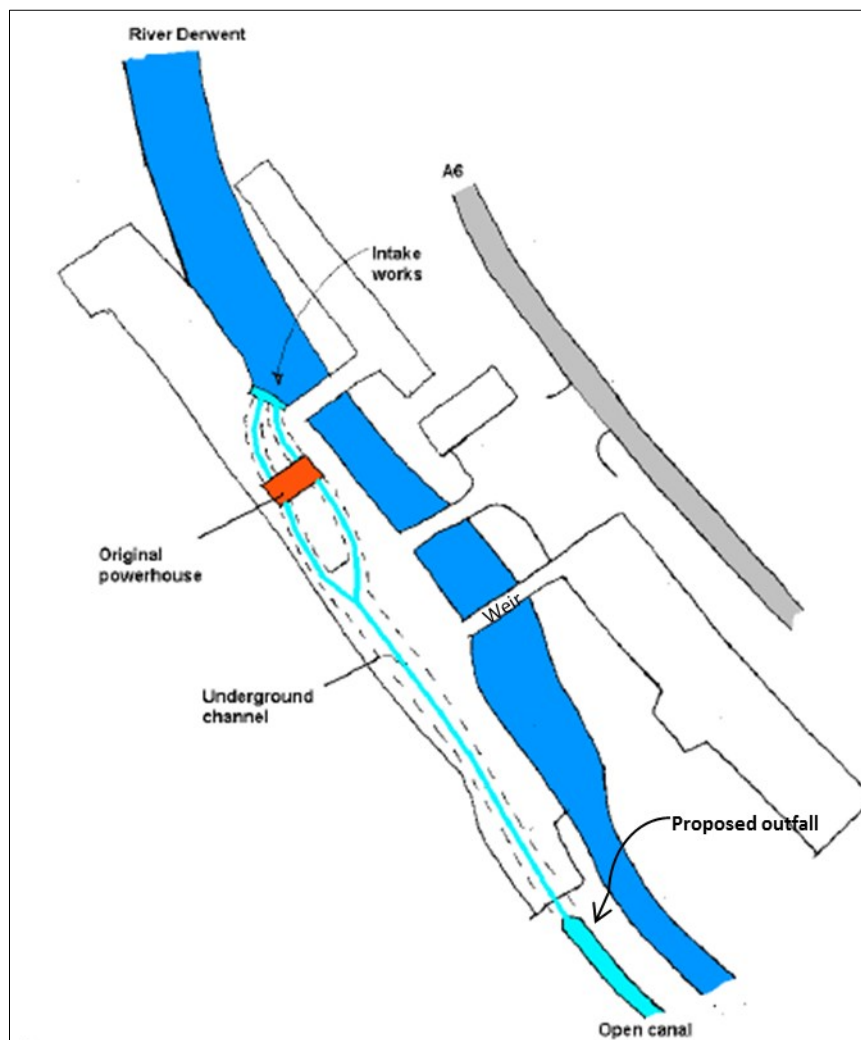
Site layout showing the intake and outfall locations, tailrace tunnel and original powerhouse.
